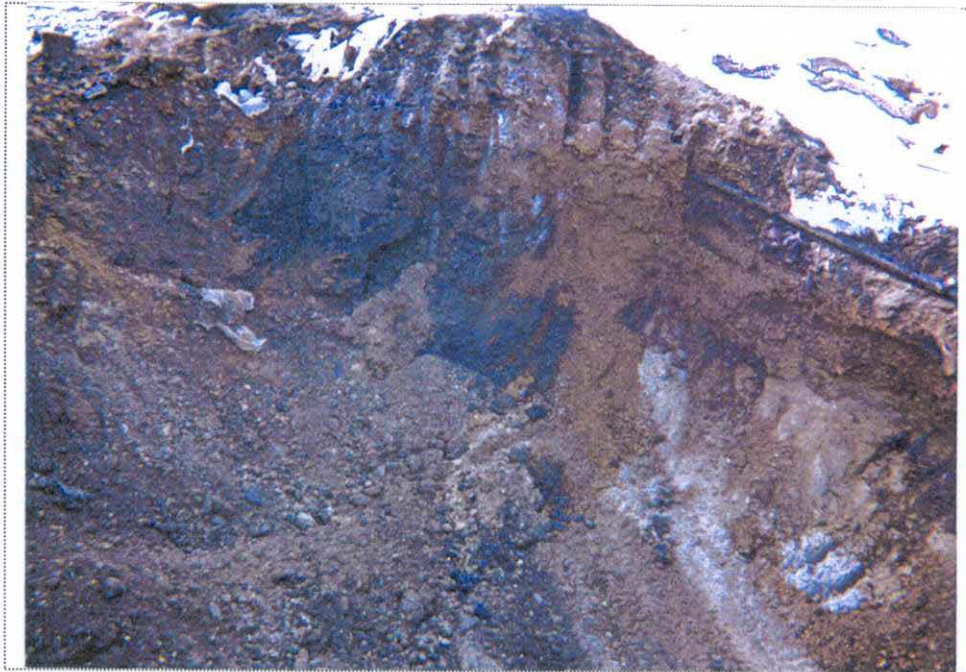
View of contamination in west sidewall of UST-9007 excavation (looking southwest).
